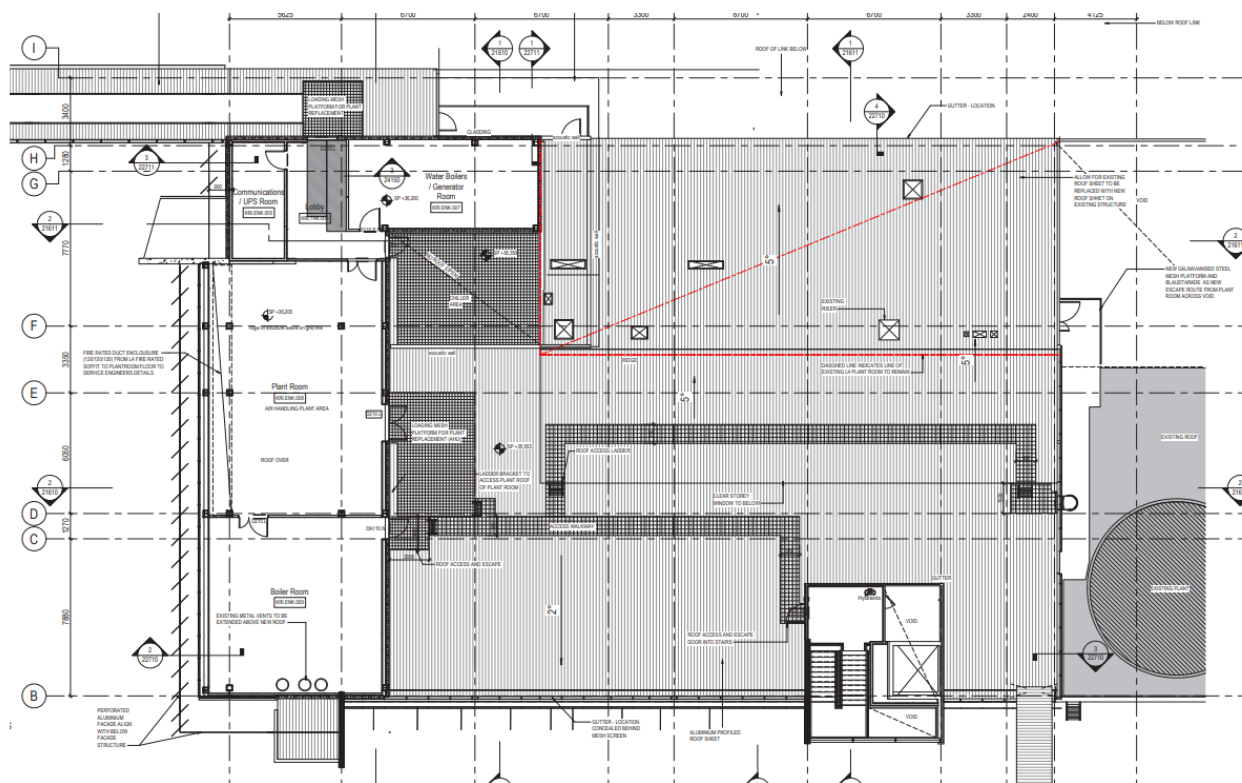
Proposed KR Level 5 Plan (Source: HDR)
